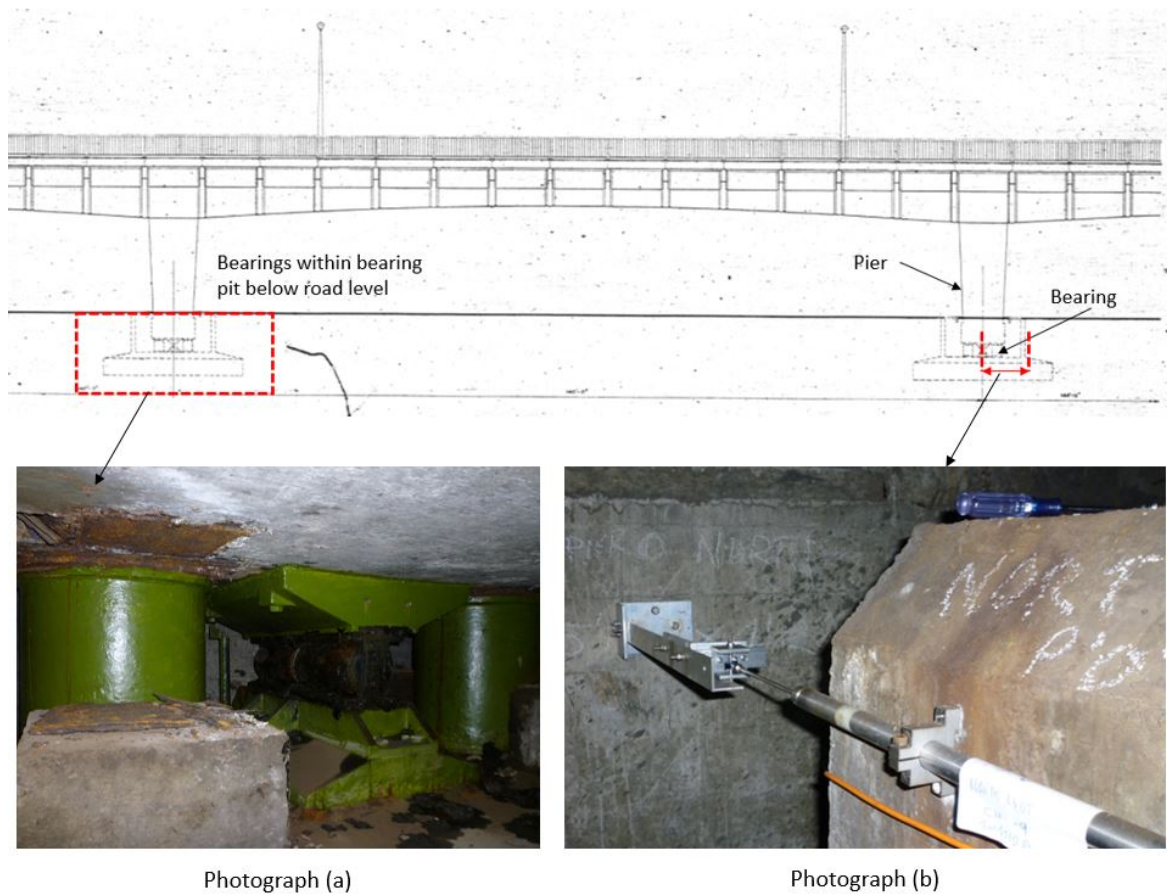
LVDT installation for bearing movement measurement. Photograph (a) shows bearing within bearing pit and Photograph (b) shows LVDT installation between wall of bearing pit and base of pier. Photographs taken by and included with permission of Graham Webb.
